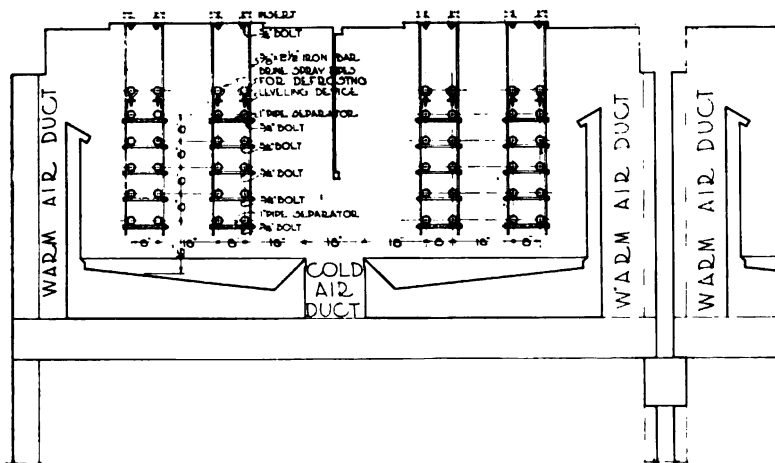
ARRANGEMENT OF PIPES OVER HOG COOLER.
